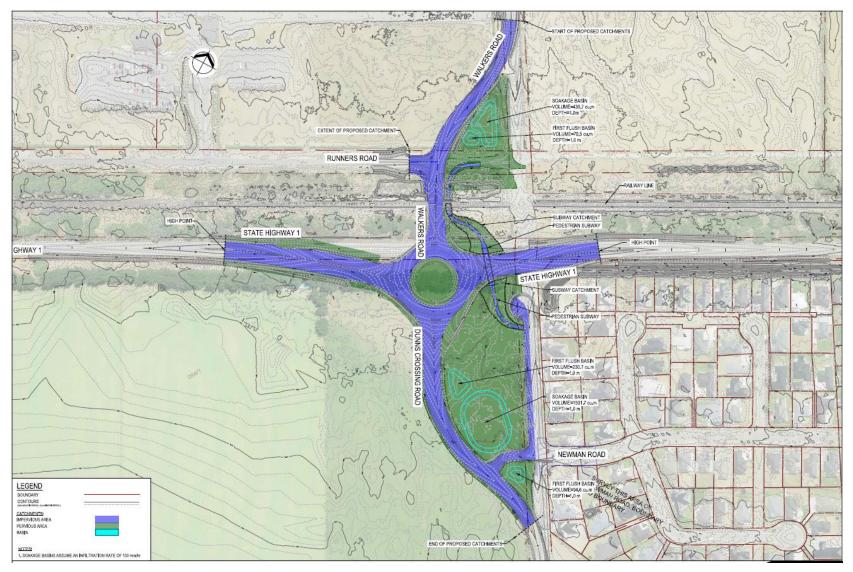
Design Plans for the proposed stormwater soakage basin, north and south of the proposed roundabout (Figure adapted from Stormwater Catchment Plan (Drawing No 3338703-10-CD-2191), Beca July 2024).
